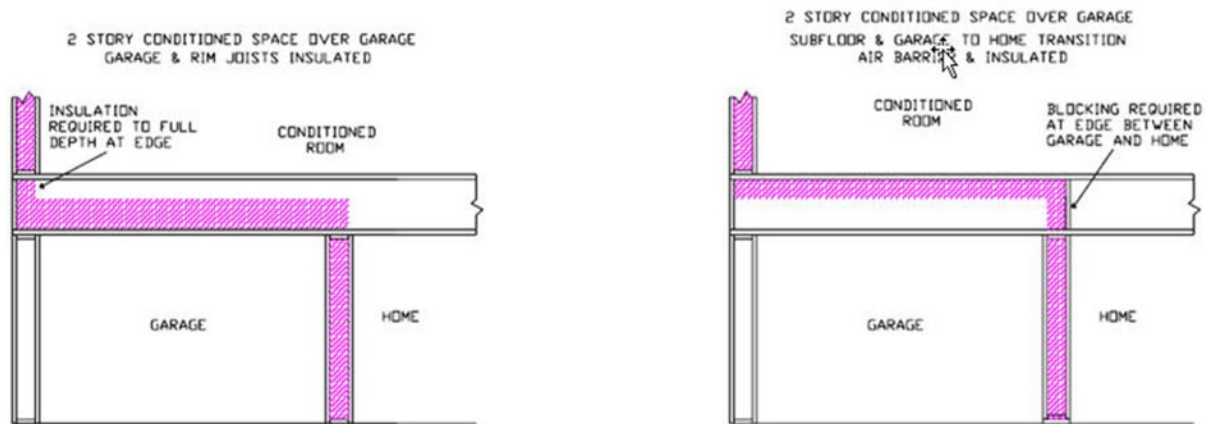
Homes with Conditioned Space Over Garage – Insulated Concrete Form (ICF)
